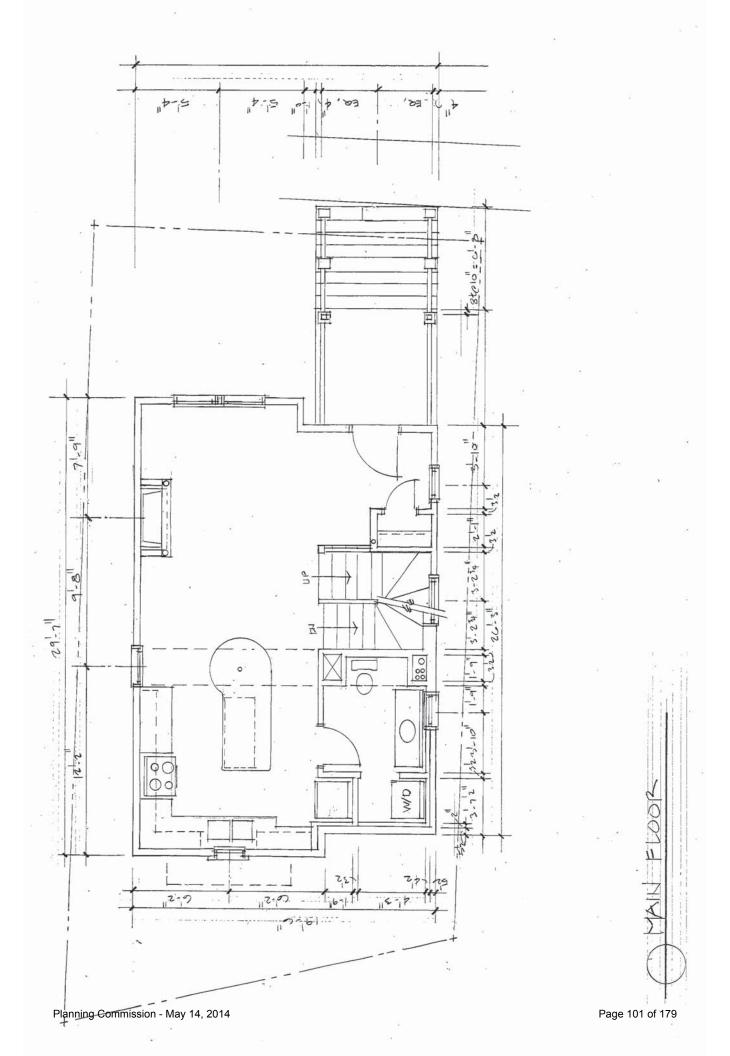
Exhibit A- Plans (existing conditions, site plan, elevations, floor plans)
